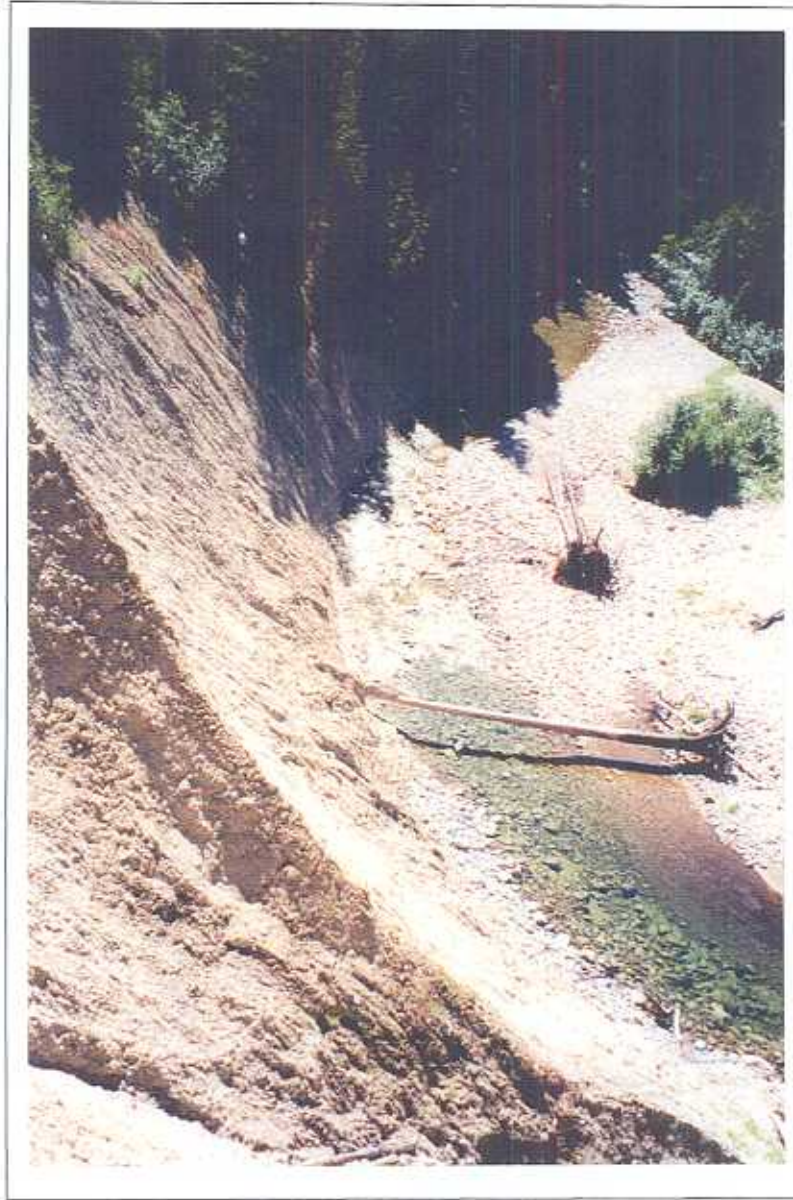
MW1, Juliet, prior to in-stream slope stabilization works.
